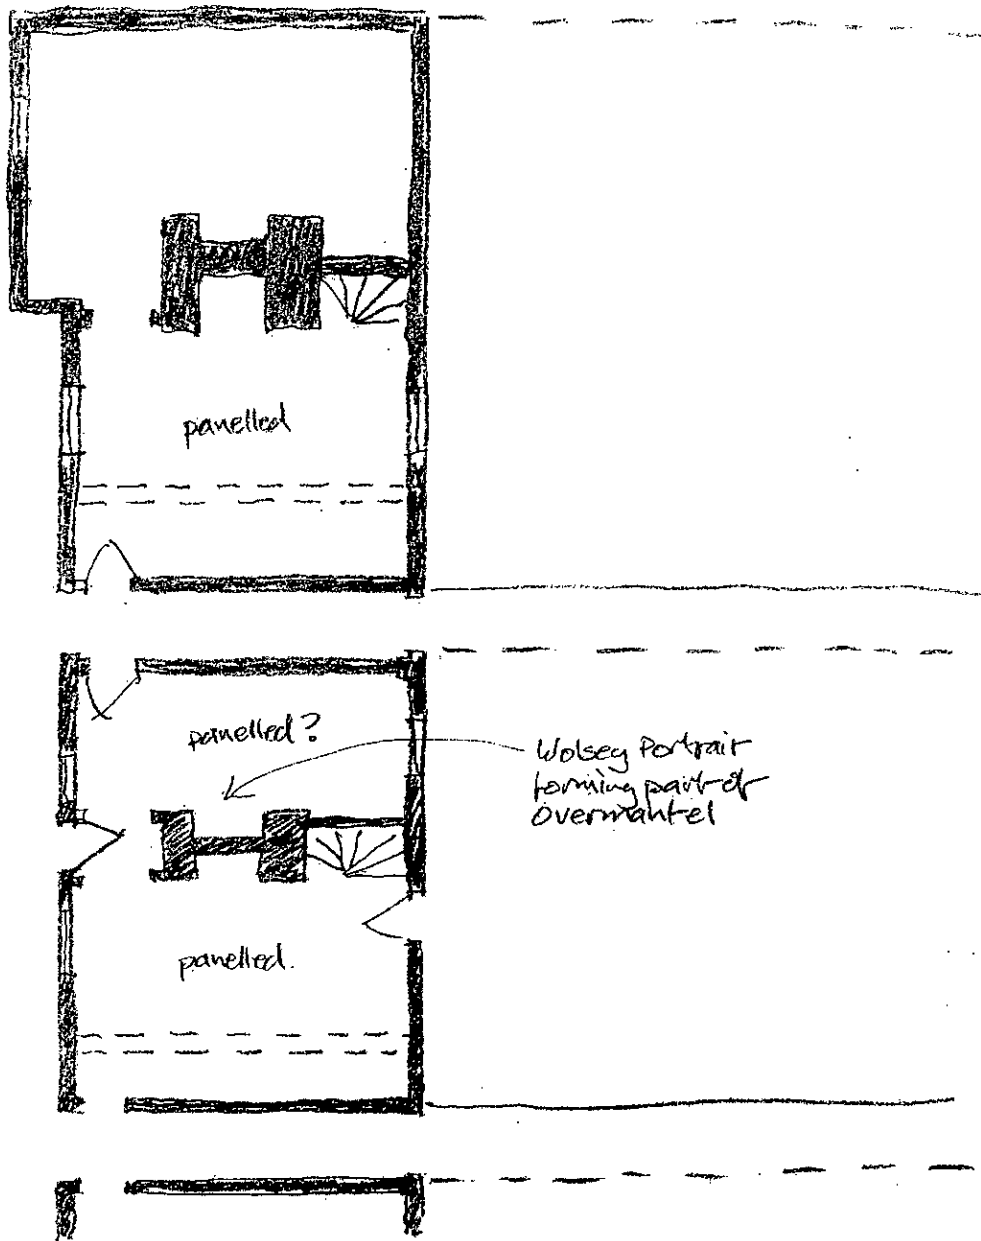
; sketch reconstruction of the seventeenth-century ground floor plan.
